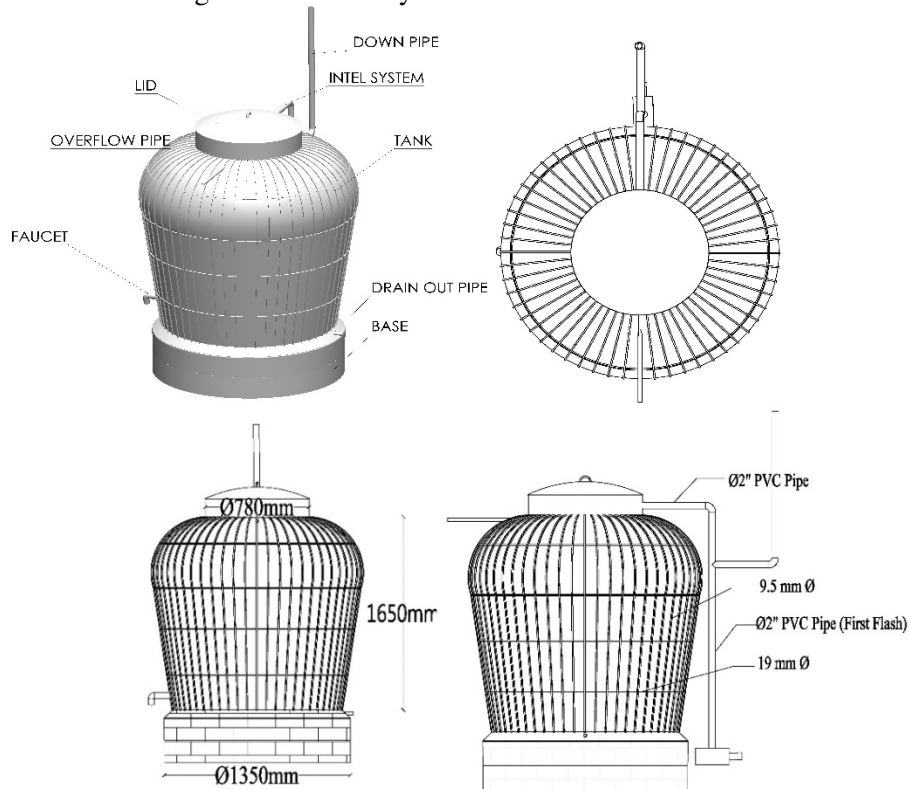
Tank design (Isometric view, top view, Back view & Side View)
